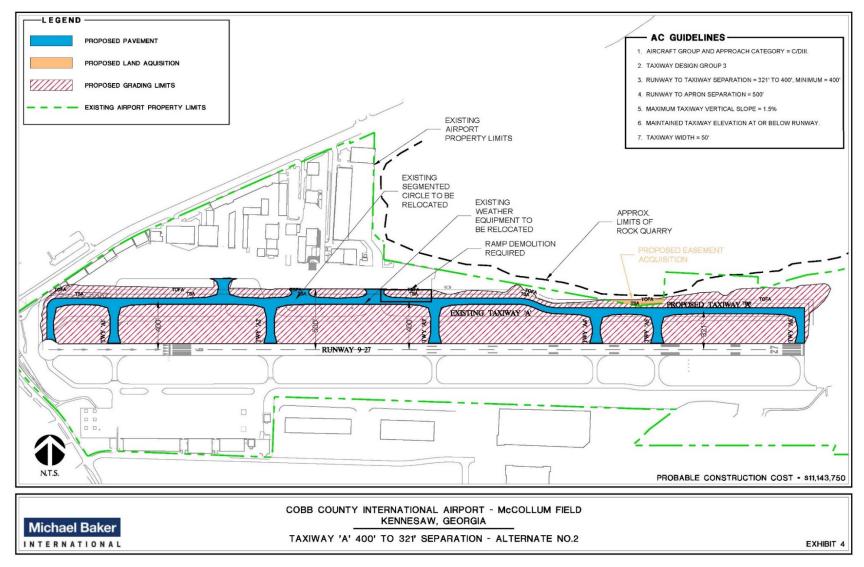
Taxiway 'A' Relocation, Alternative 1c (321 to 400-foot Runway/Taxiway Separation)
